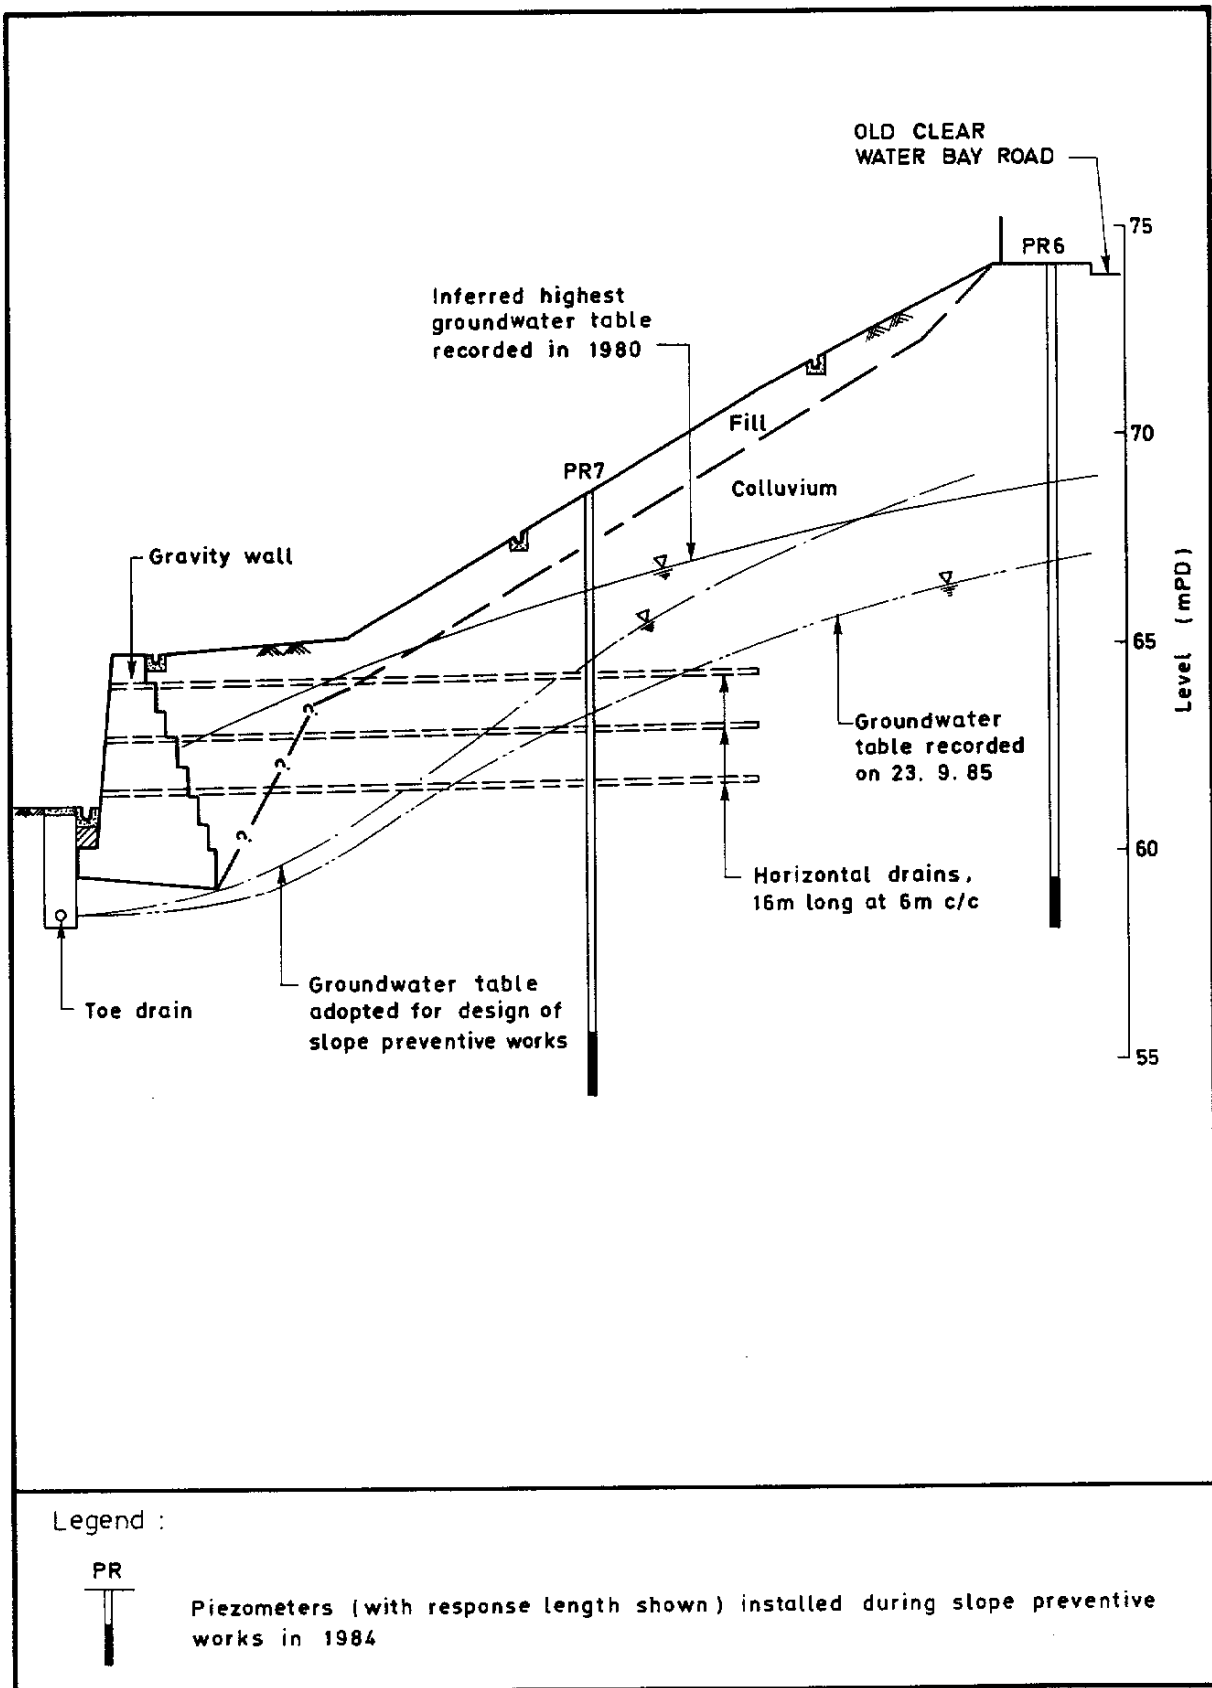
Typical Section Showing Ground Conditions and Positions of Horizontal Drains at Slope 11NE-A/CR85, Choi Wan Estate (after Fugro, 1986)
